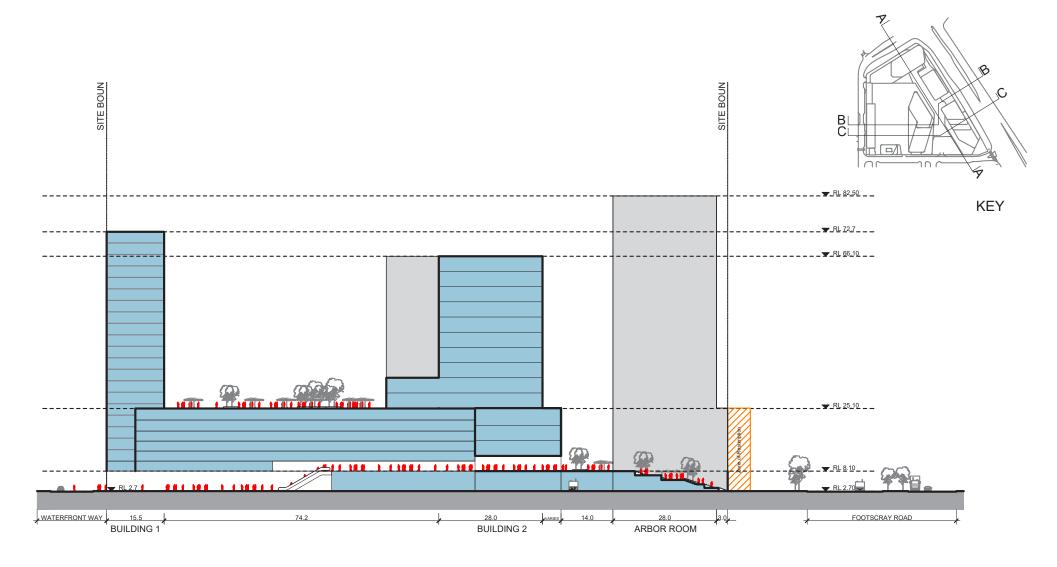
Movement and Parking Plan 5 - Elevated open space and pedestrian access points
